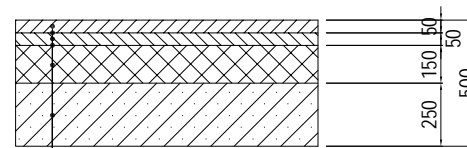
# DETAIL OF ASPHALT CONCRETE PAVEMENT S=1:30
